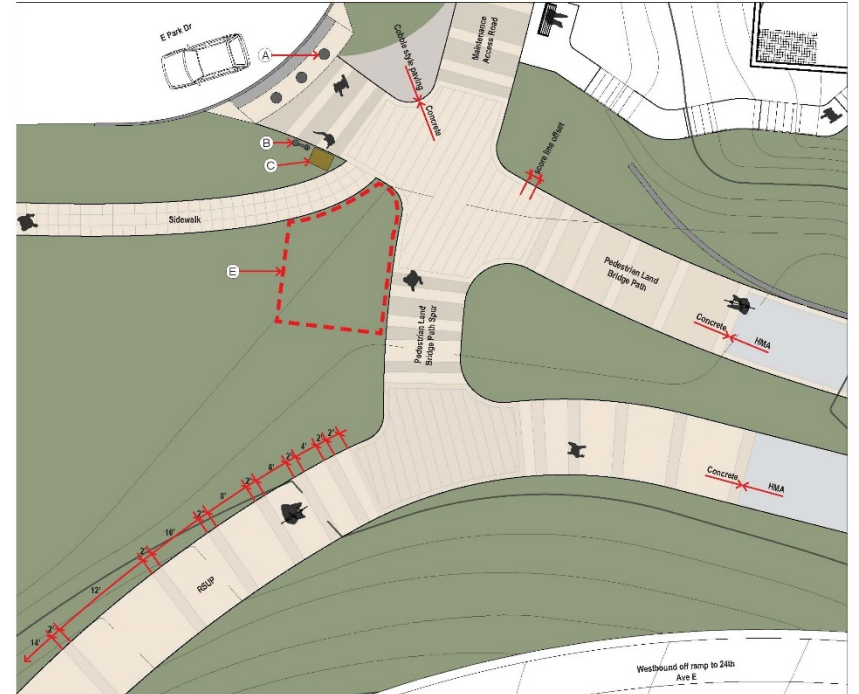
Pedestrian Land Bridge Path and RSUP intersection enlarged plan
